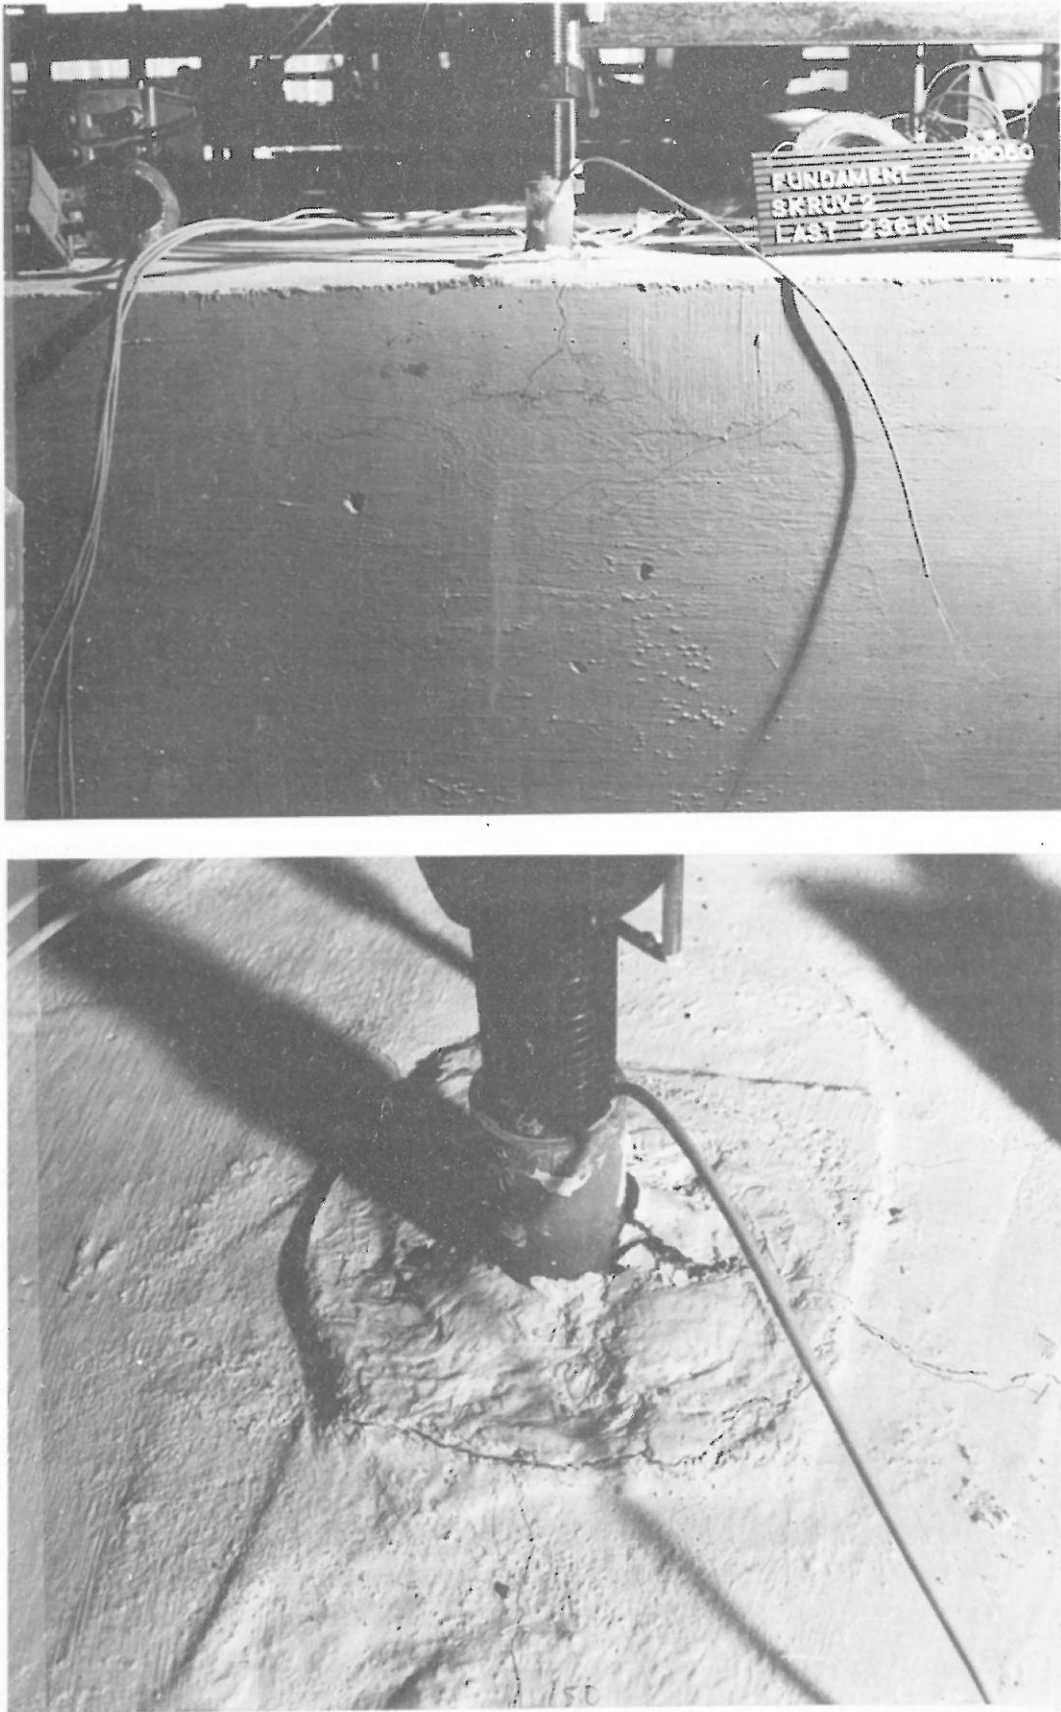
Anchor bolt SC 1:2 at failure. Conical recess with 200 mm depth and 150 mm edge distance. Anchor bolt M27 with washer $\phi 45 \times 3$. Reinforcement mesh $\phi 10$ Ks 400 # 200. Ultimate load 236 kN
